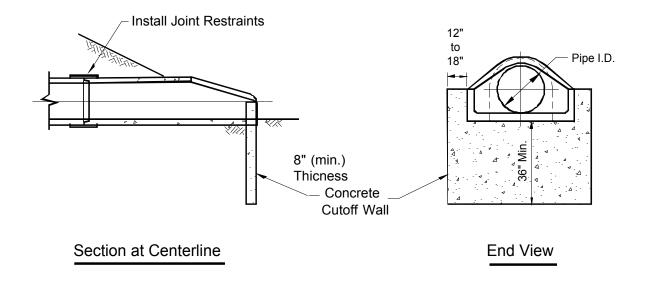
Concrete Flared End Section with Cutoff Wall for all Pipe Outlets
